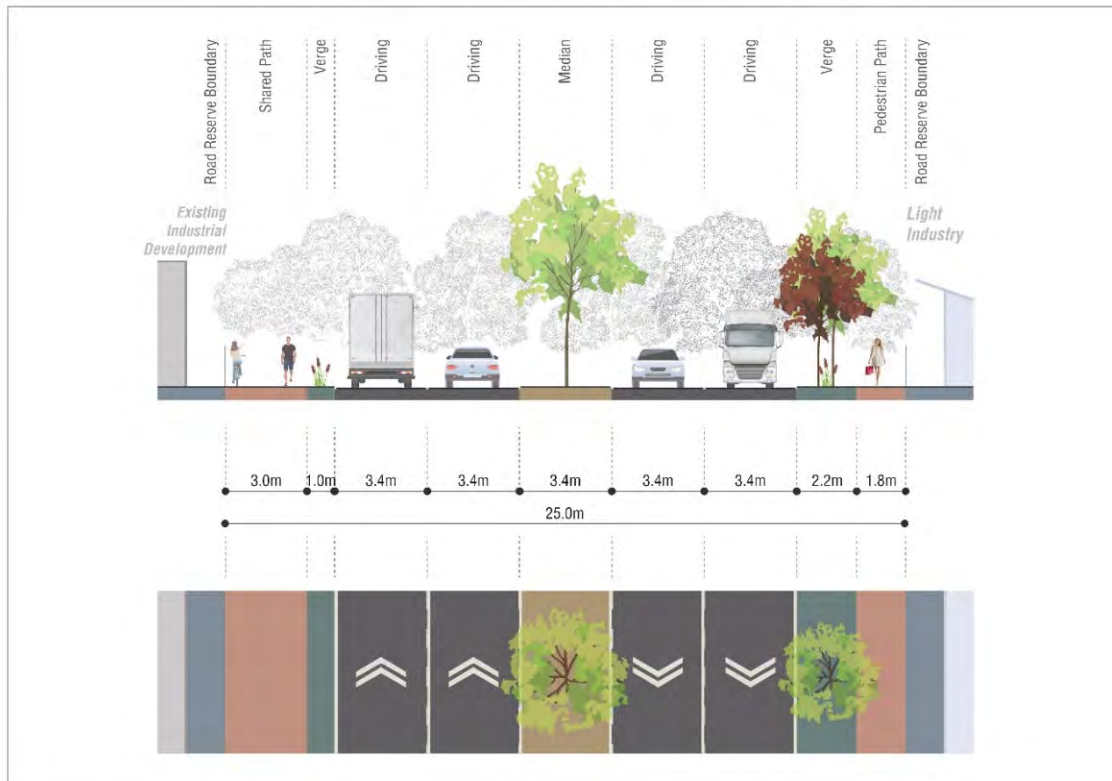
RD02 Milner Road Cross Section (Sultana Road West to Stewart Road)
